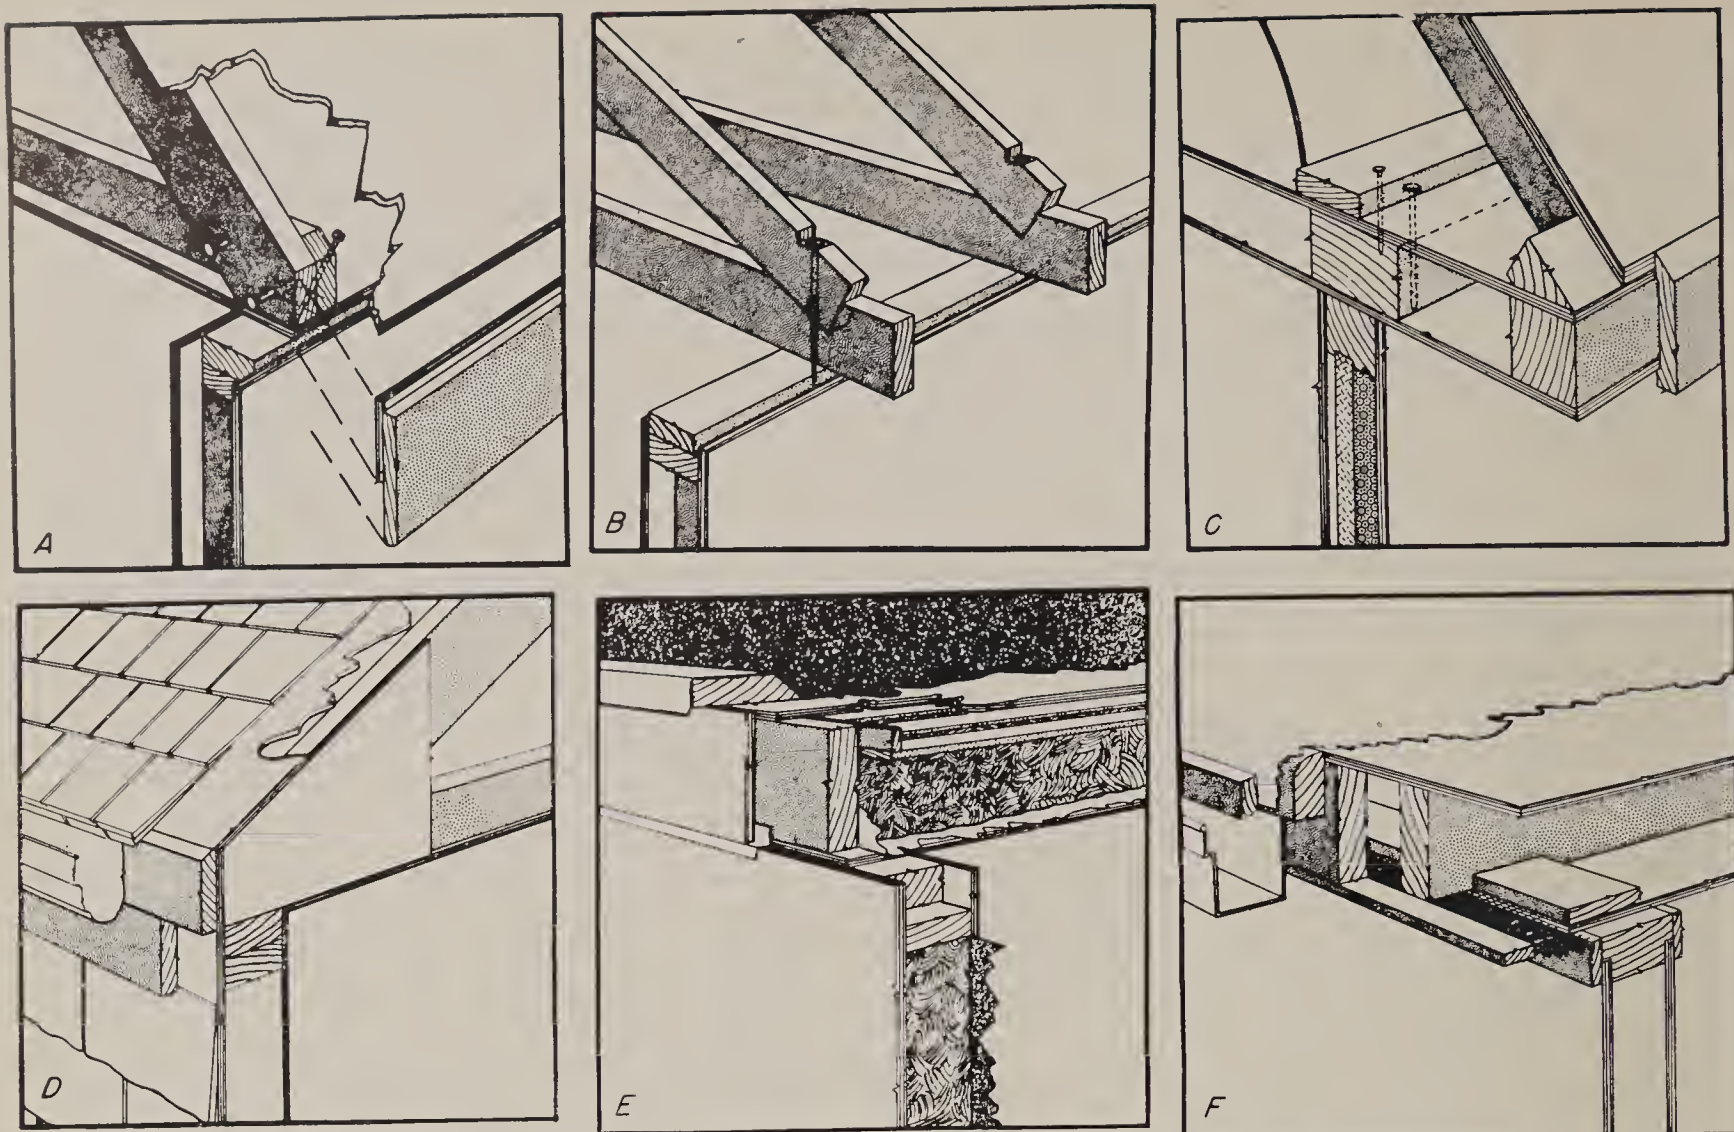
Various methods of joining roofs to walls. *A*, pitched roof rafter fastened to ceiling joist and joist to top plate of wall panel; *B*, pitched rafter seated in joist and assembly fastened with a single lag screw to panel plate; *C*, block joint with lateral thrust exerted against block attached to second-floor panel, which is in turn fastened to top wall plate; *D*, truss-type roof; rafter or upper chord firmly held to joist or lower chord of truss with nail-glued gusset plates and truss fastened to wall plate. *E* and *F*, flat roofs consisting of stressed-cover panels which act as box beams.
